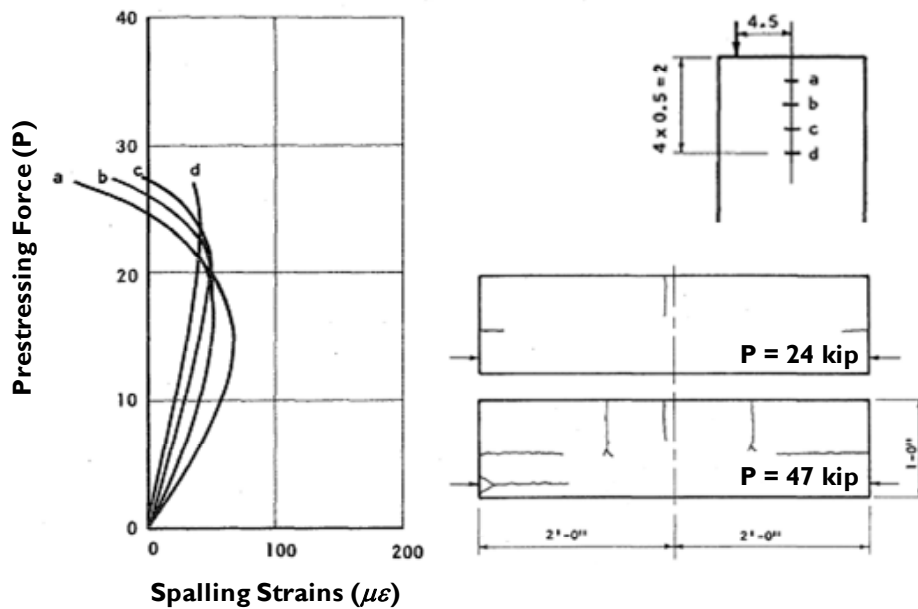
Prestressing force & spalling strains for a rectangular beam
